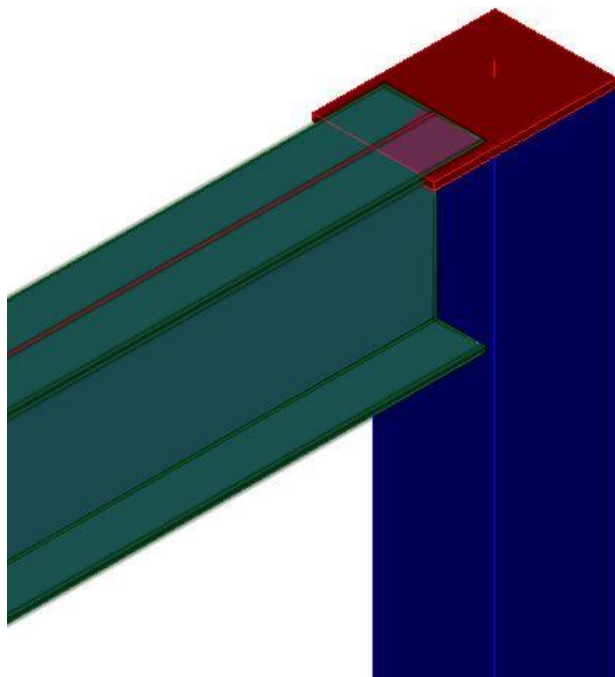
View of Column, Beam & Plate in shaded view at an angle
